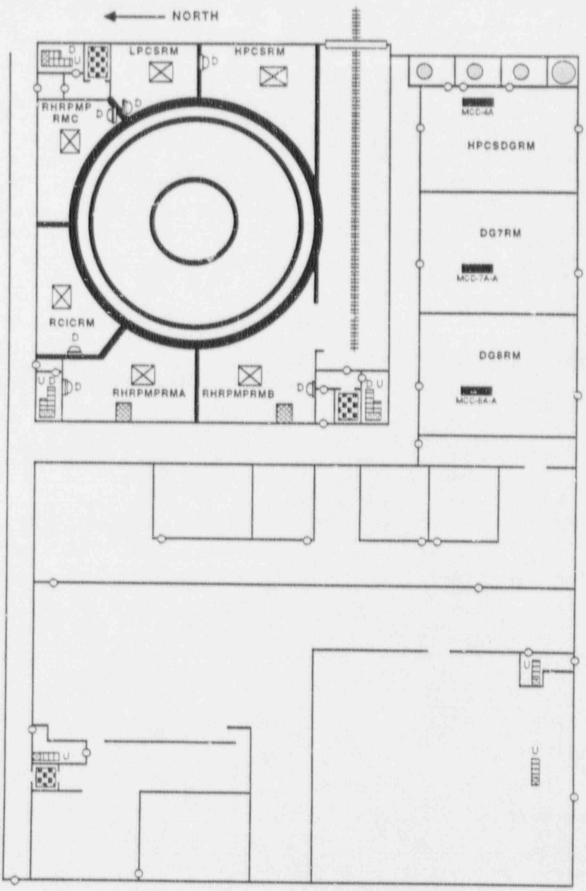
WNP-2 Reactor Building Elevation 441'0" to 444'0", Diesel Generator Building Elevation 441'0" and Radwaste Building Elevation 437 0"
